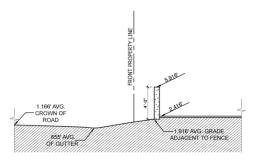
Pedestrian View Section from point 5' above Crown of Road on S Vista del Mar. (Addition height is not in the line of sight)
